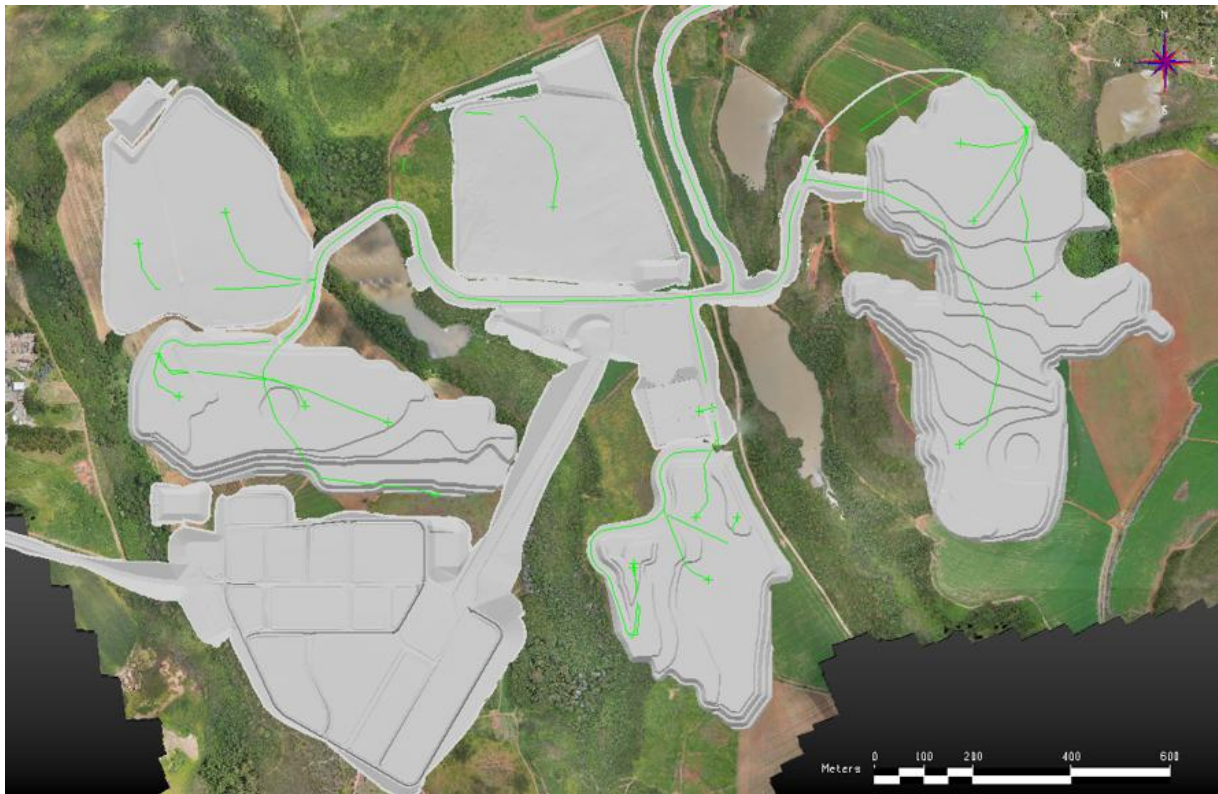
MinePlan haulage route design used to define operational haulage paths and cycle-time requirements for the first 3 sequenced mining pits, Residue Storage Facility and mine waste stockpile.
